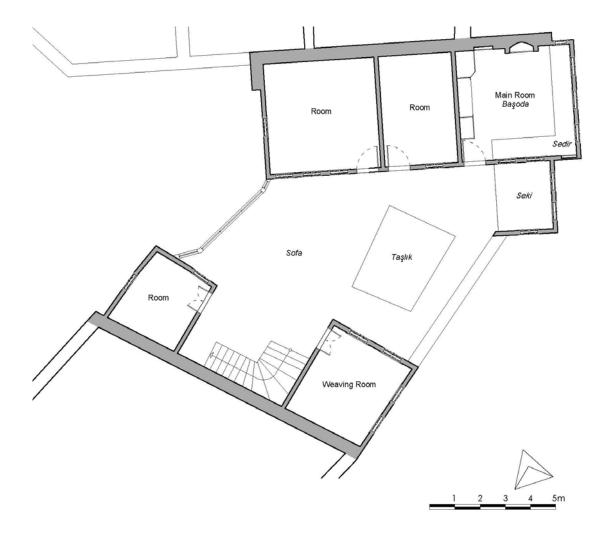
The plan of the first floor of Zühtü Bey House.
